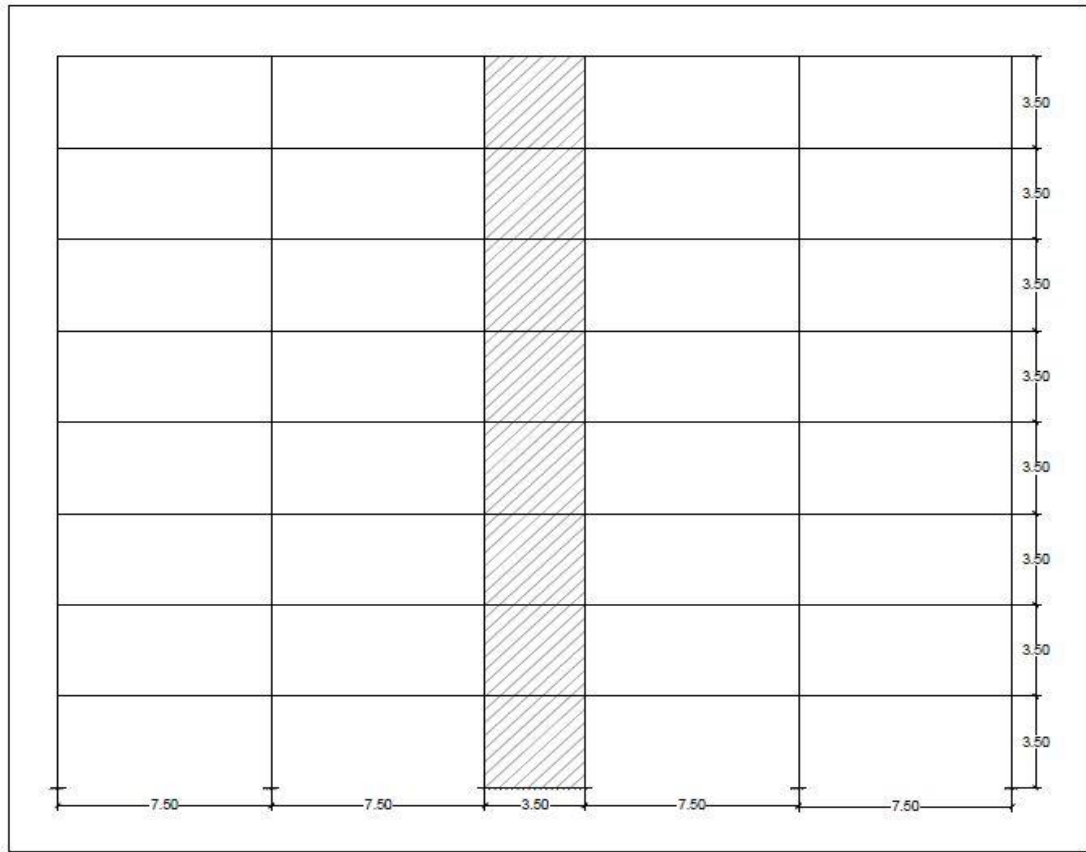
Elevation of 8-story building with steel plate shear walls having different plate thicknesses
